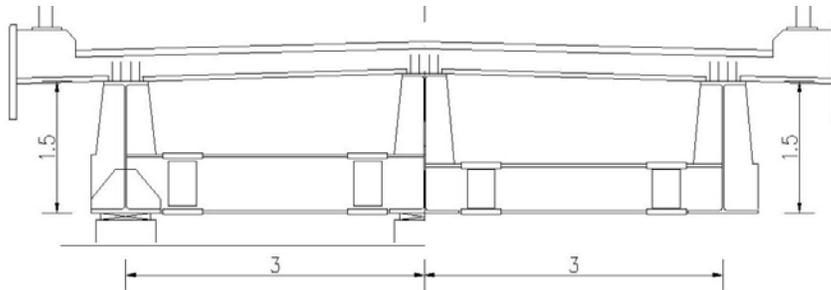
Typical cross section of the Asti-Cuneo motorway overpasses
